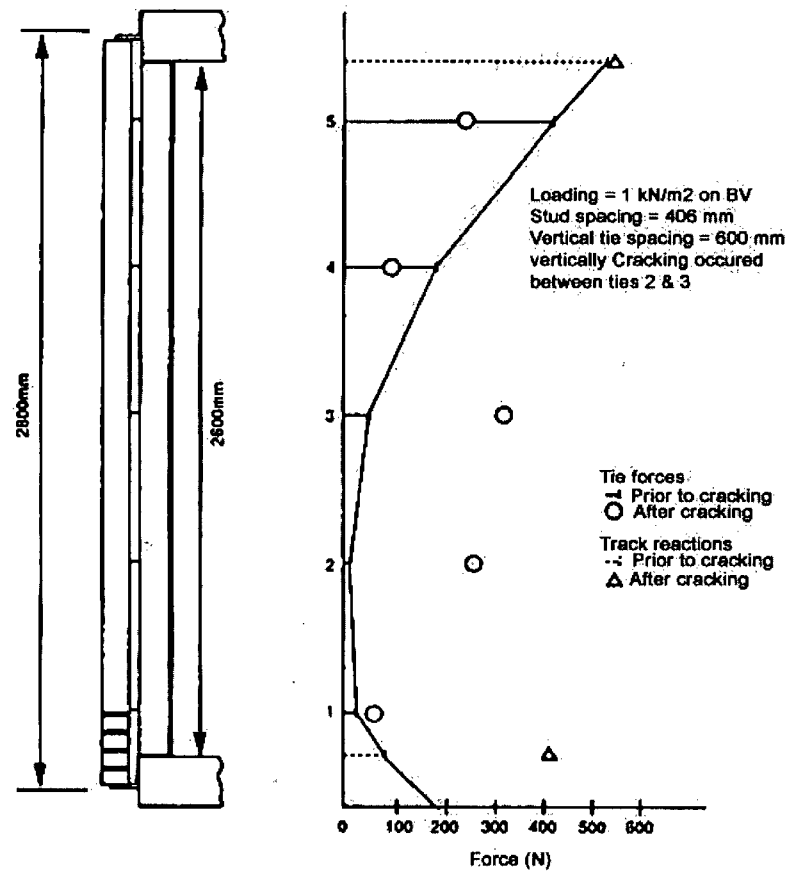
Distribution of tie forces prior to cracking (uncracked) and after cracking (post-cracked). (From Ref. 23)
